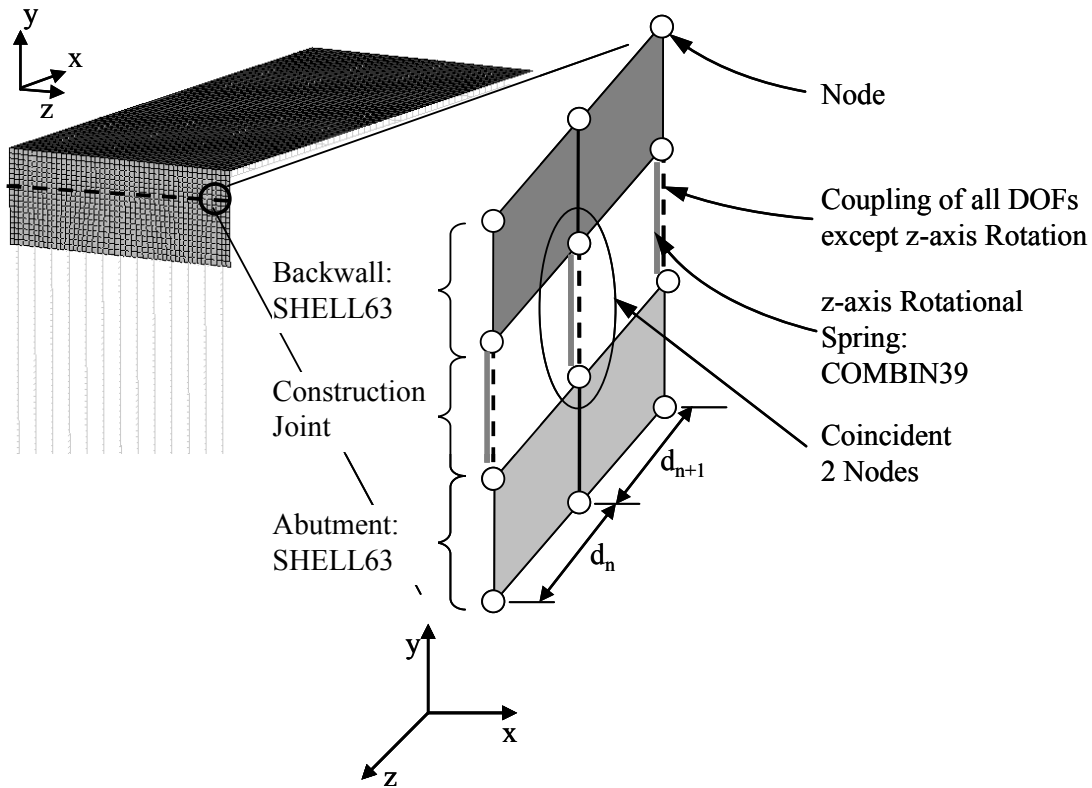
Example 2 Abutment to Back-wall Construction Joint Modeling
